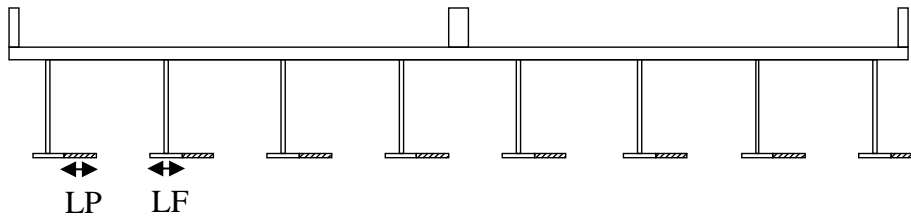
Illustration of horizontal plates installed on the bridge girders oriented towards the downstream direction with $LP = LF$ (Case H2)
